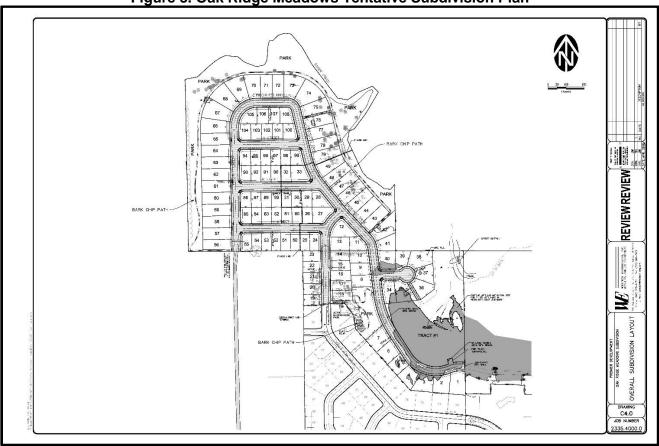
Oak Ridge Meadows Tentative Subdivision Plan
